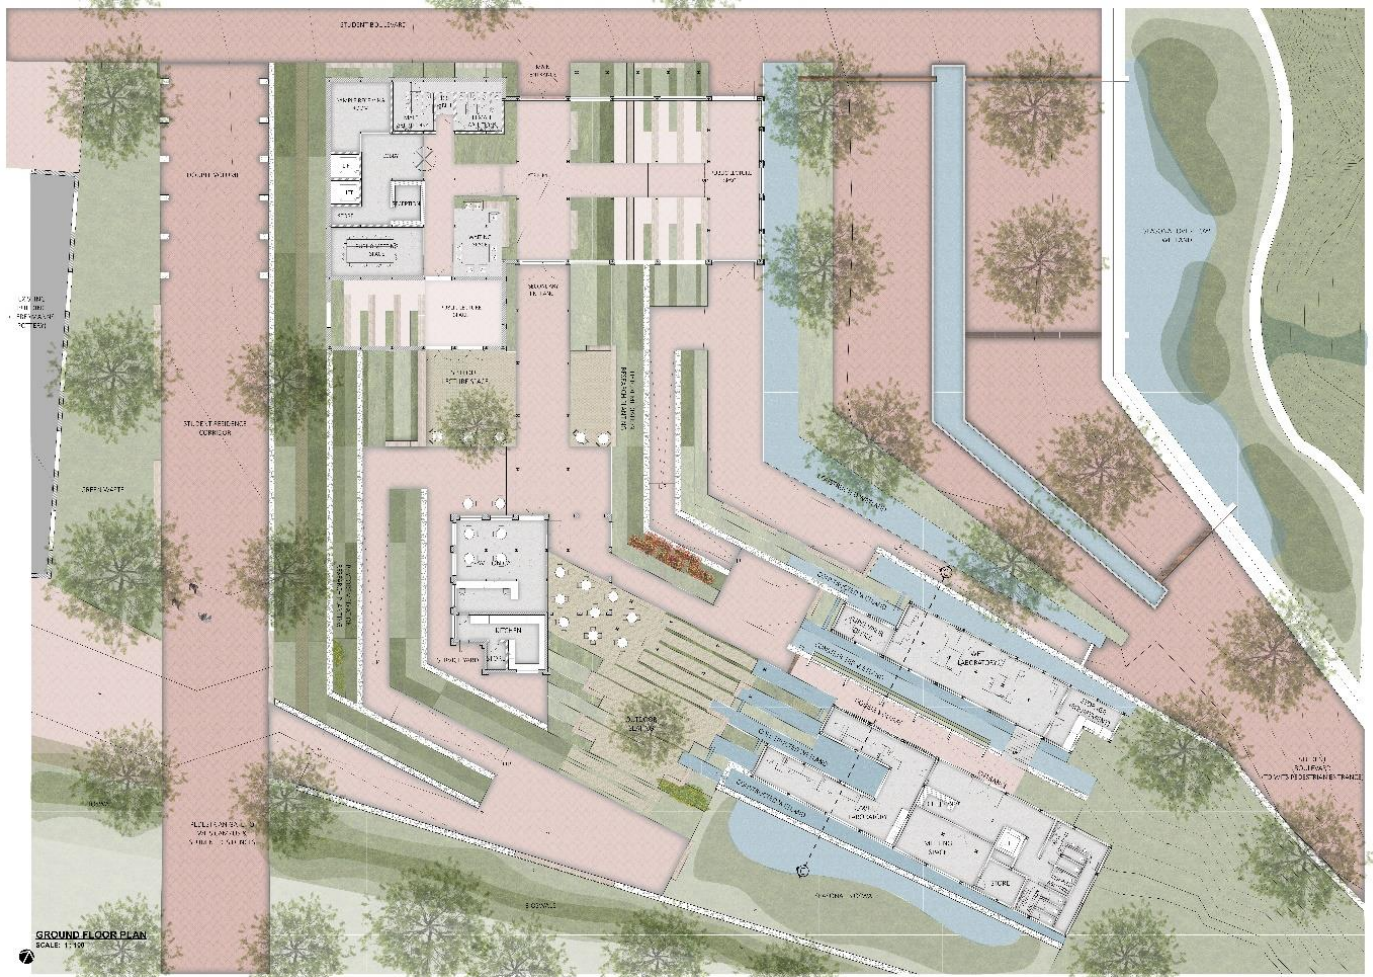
The ground floor plan (incomplete) demonstrating how the terraced topography connects the buildings and Phytoremediation spaces (constructed wetlands and mixed planting spaces).
